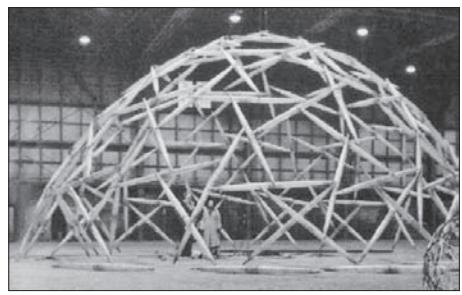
B. FULLER AND S. SADAQ: DOME OVER MANHATTAN, 1960.
